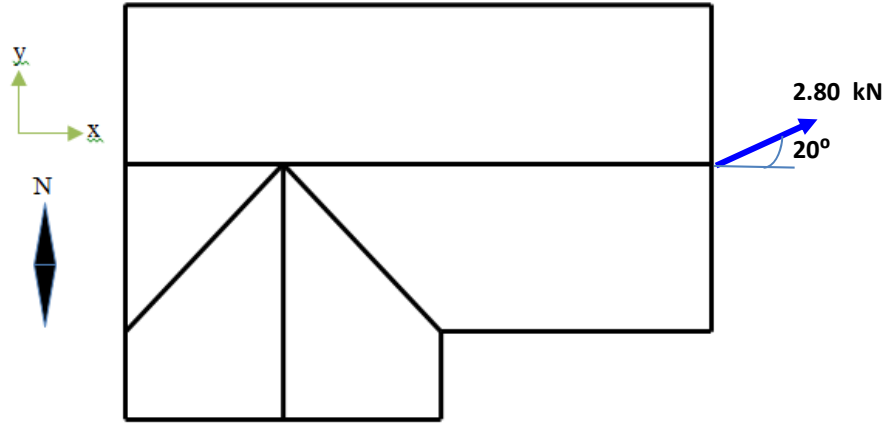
Load Case 15 – 2.80 kN Applied to Roof Ridge of East Gable-End (at 20 degrees)
